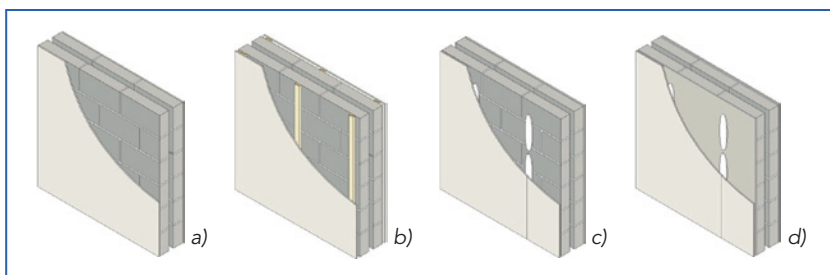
Typical blockwork cavity separating walls found in the UK: a) plaster finish ; b) strap and lined with gypsum board ; c) gypsum board on dabs ; d) 8 mm parge coat with gypsum board on dabs. [[2] - (U.K.)].
